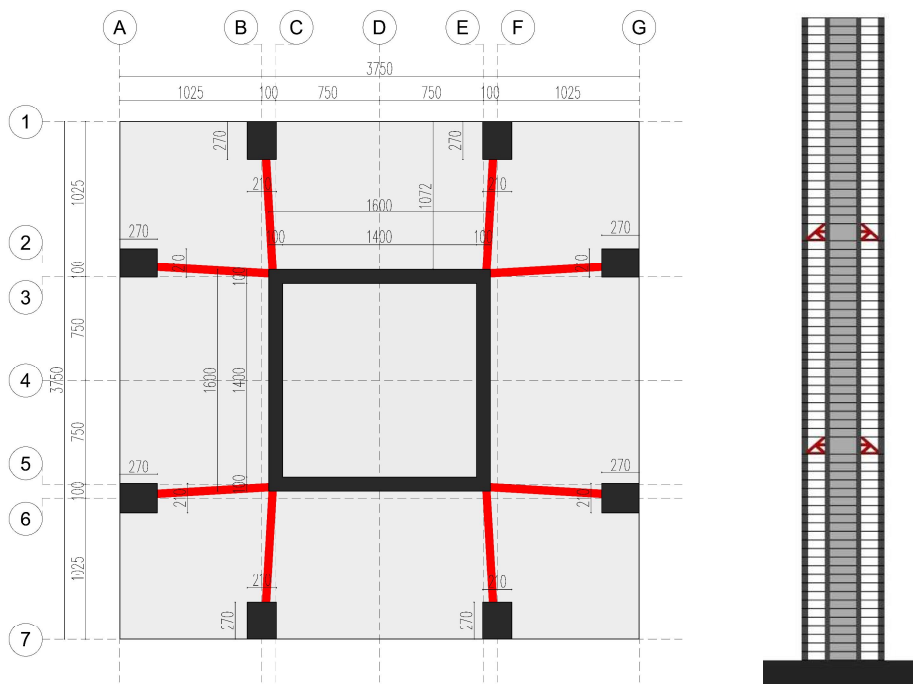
Typical floor plan and elevation of model "OF_OPT_1" with outriggers
